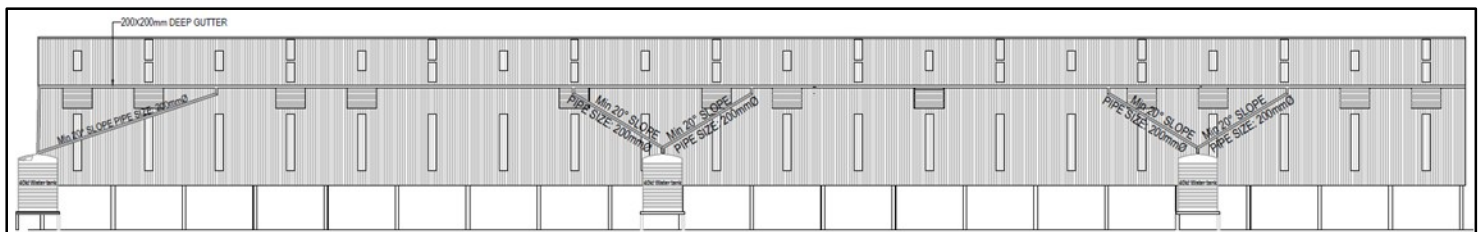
South elevation of building depicting the position of the required down pipes and water tanks.
